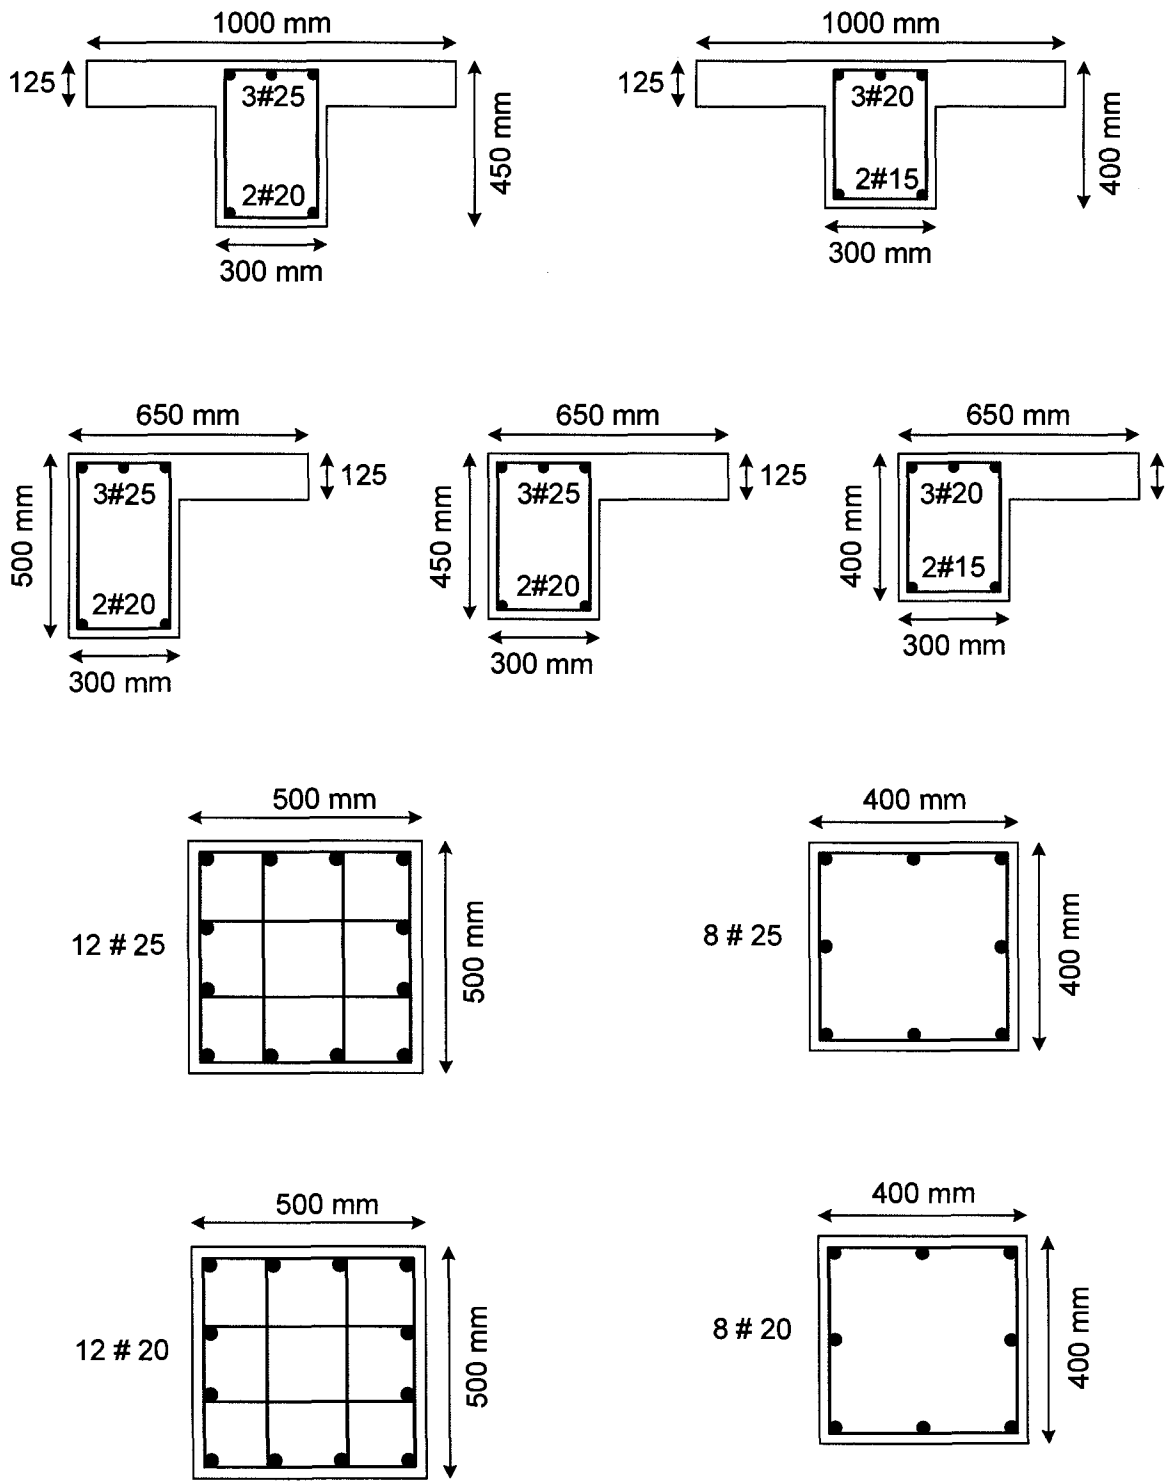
Design details for frame elements of 5-storey and 10-storey reinforced concrete buildings with 6.0 m spans
